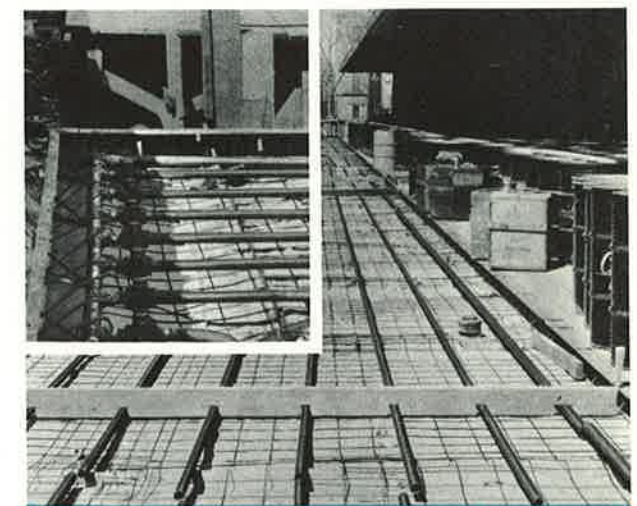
Snow melting system being installed in loading dock at Wallingford, Conn., plant of American Cyanamid. System is operated by waste heat. Figure 49 (inset): Balancing cocks at headers were added because of long run.
